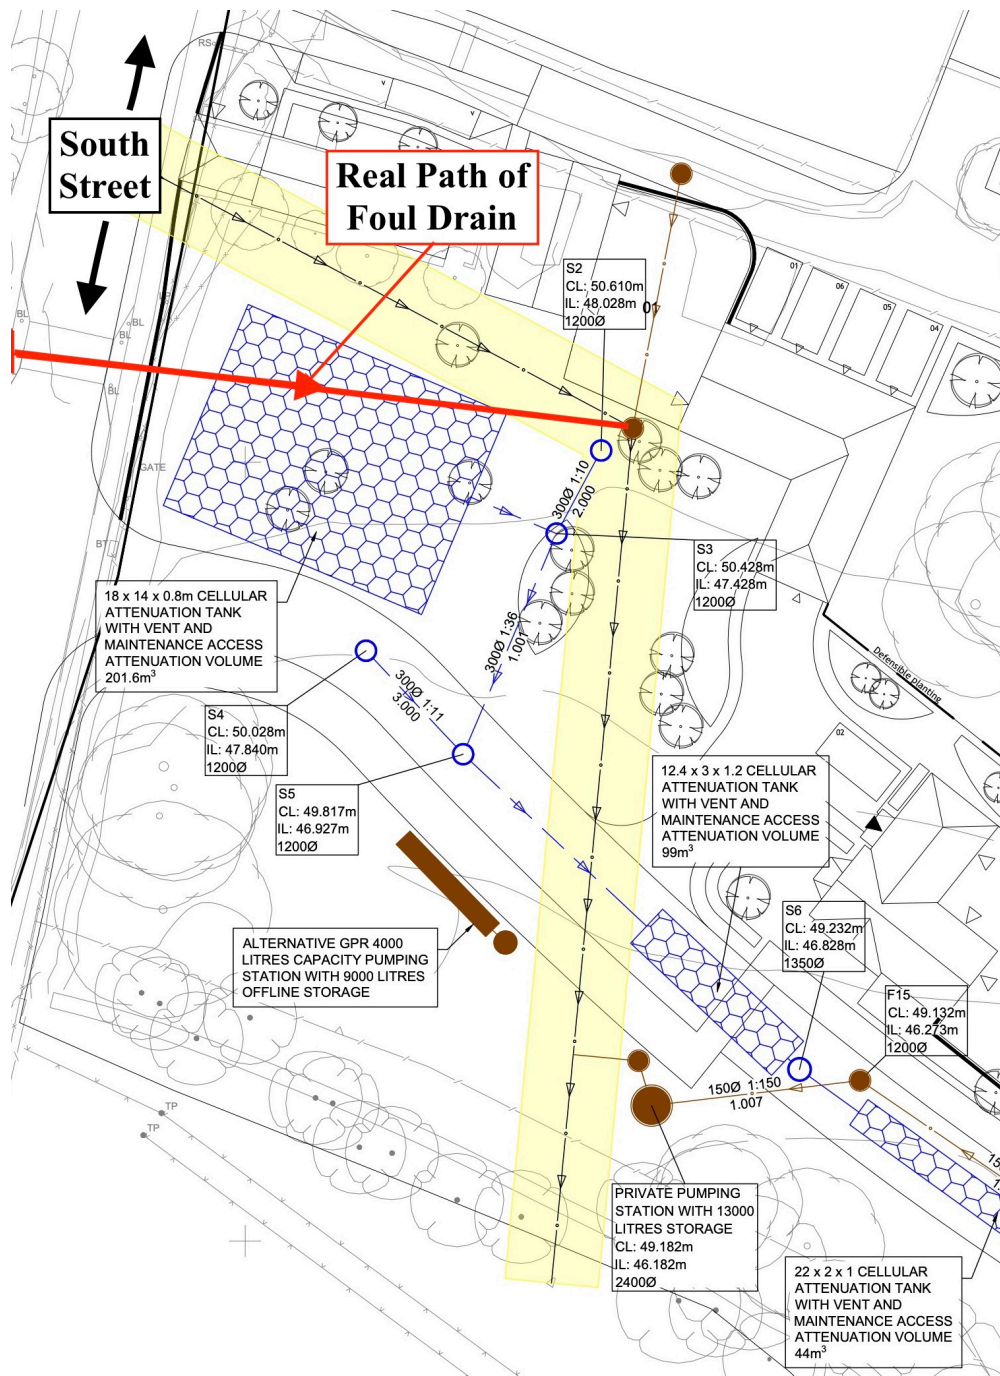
Applicant's plan showing route of sewer marked in yellow compared with Southern Water plan shown in red.
